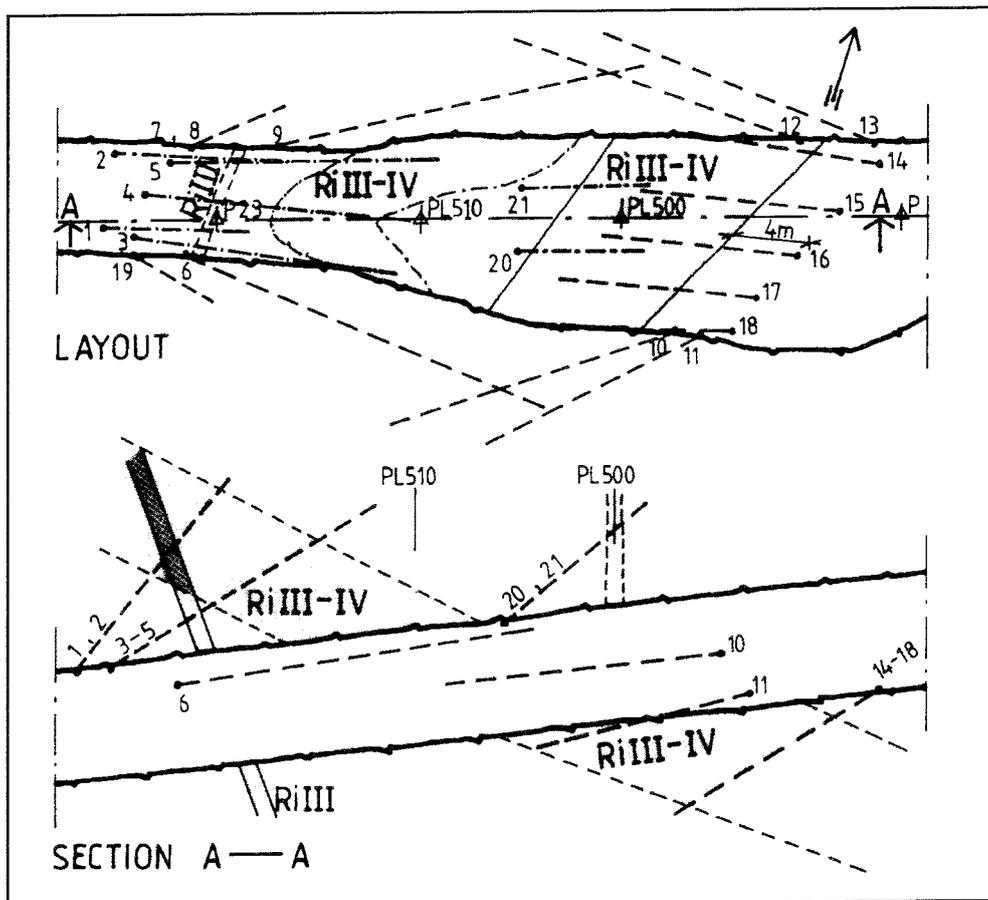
VLJ Repository. Grouting plan of the RC zone in the access tunnel.
